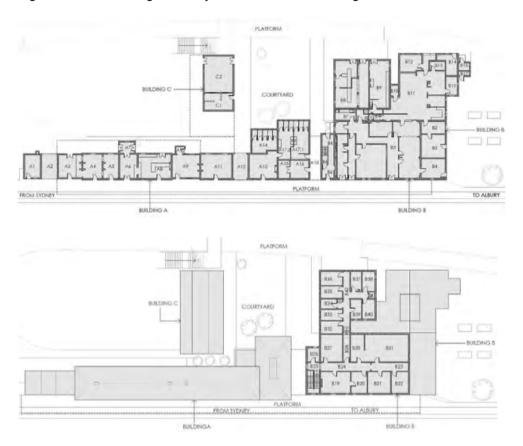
Diagram indicating the key buildings. The top panel shows the ground floor arrangement and the bottom panel the first floor (OCP Architects, 2020a:59)
